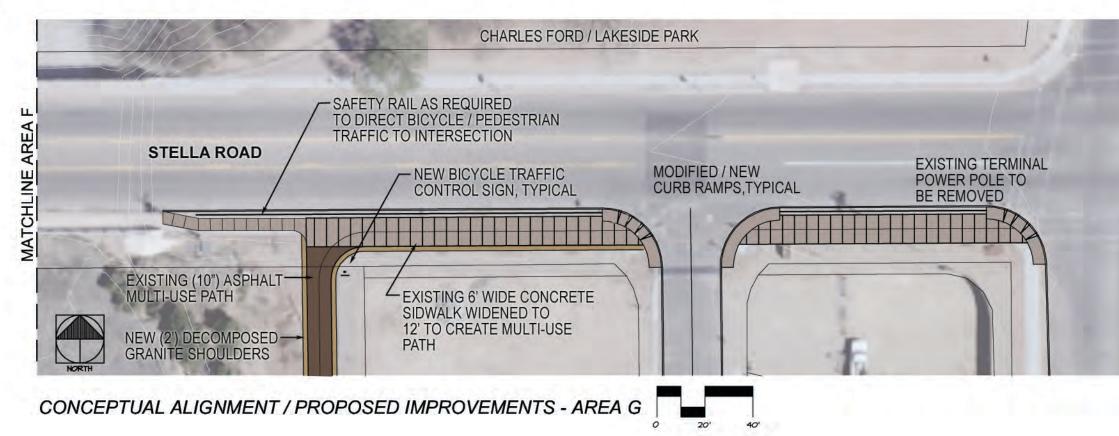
J Atturbury Wash Greenway Master Plan Escalante Road to Stella Road Segment
